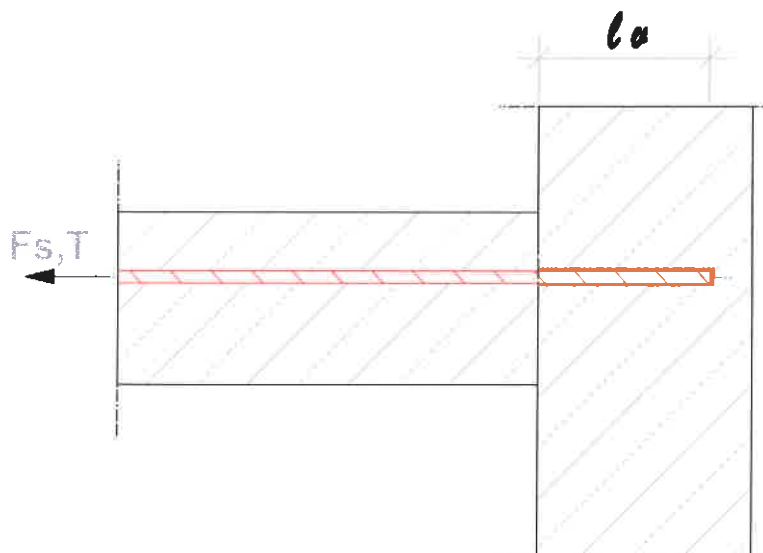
Schematic representation of rebar connection version ANCHORING
